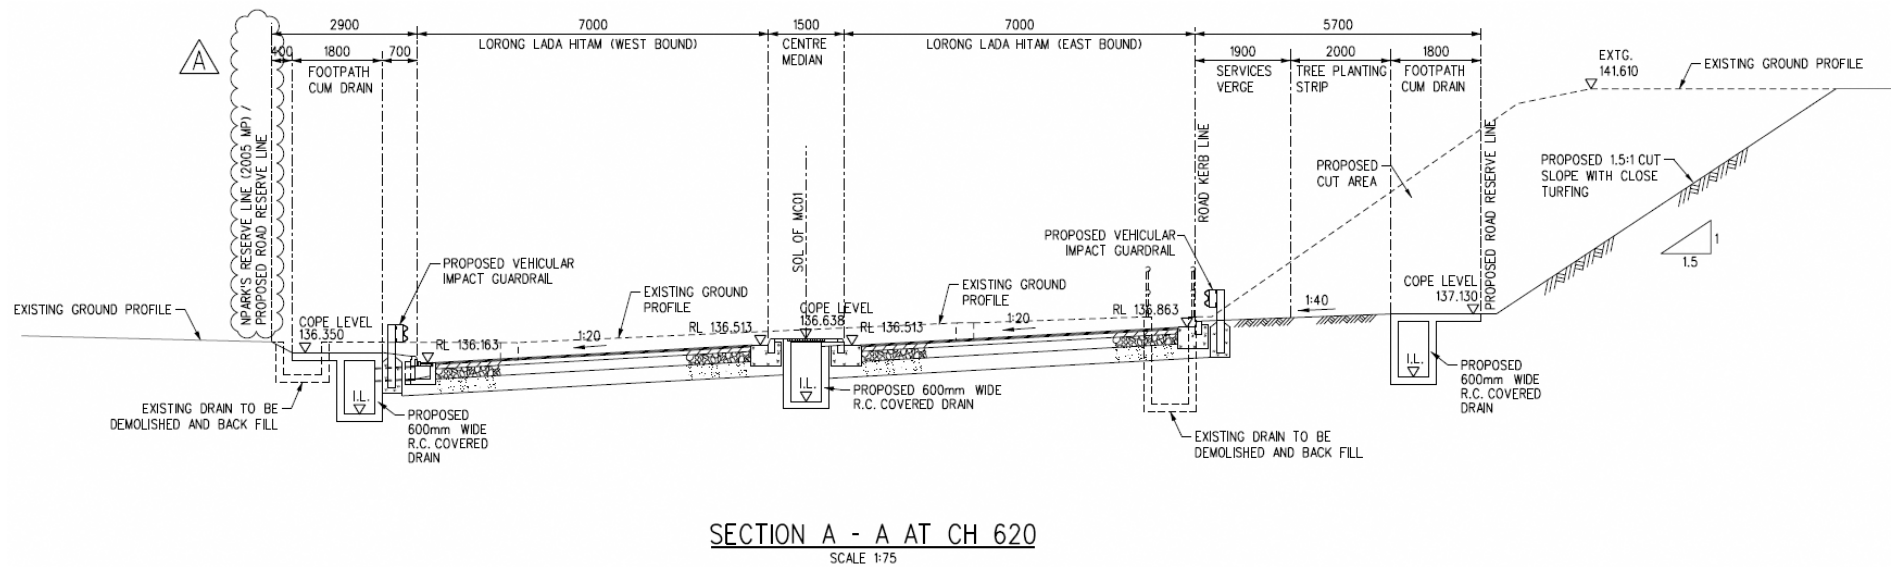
Proposed Construction cross-section for CH 620 (Source: BCA, 2022)
